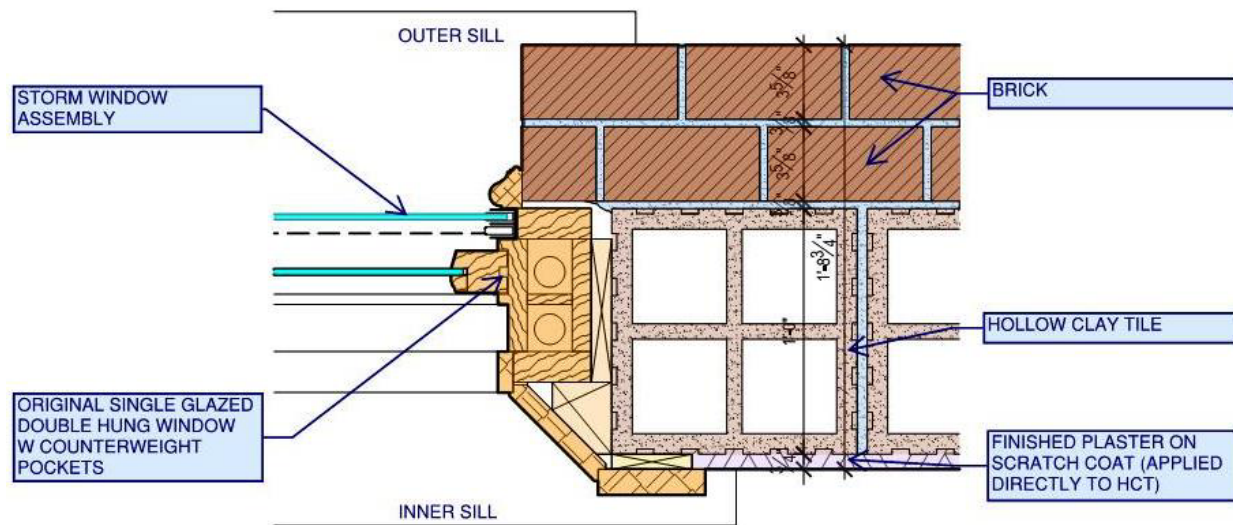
Plan Detail at 1<sup>st</sup>, 2<sup>nd</sup> Floor Jamb
